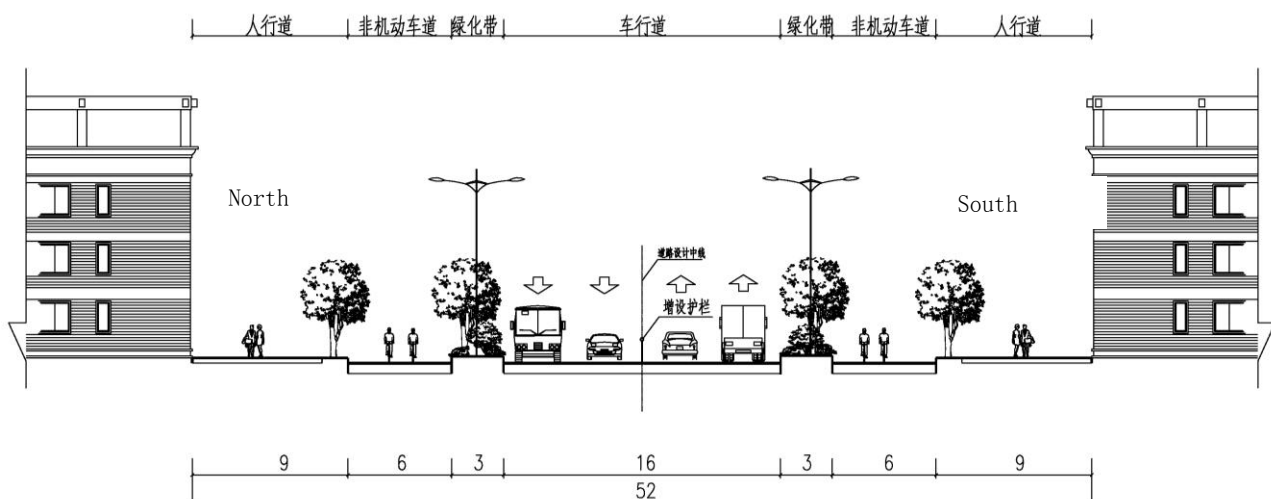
Sectional View for Reconstruction of Biyun Road (Hankou-Danjiangkou Railway ~ Jinqiu Avenue)
